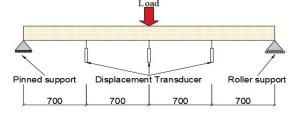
Static scheme of laminated timber beam for bending test (dimension in mm).
